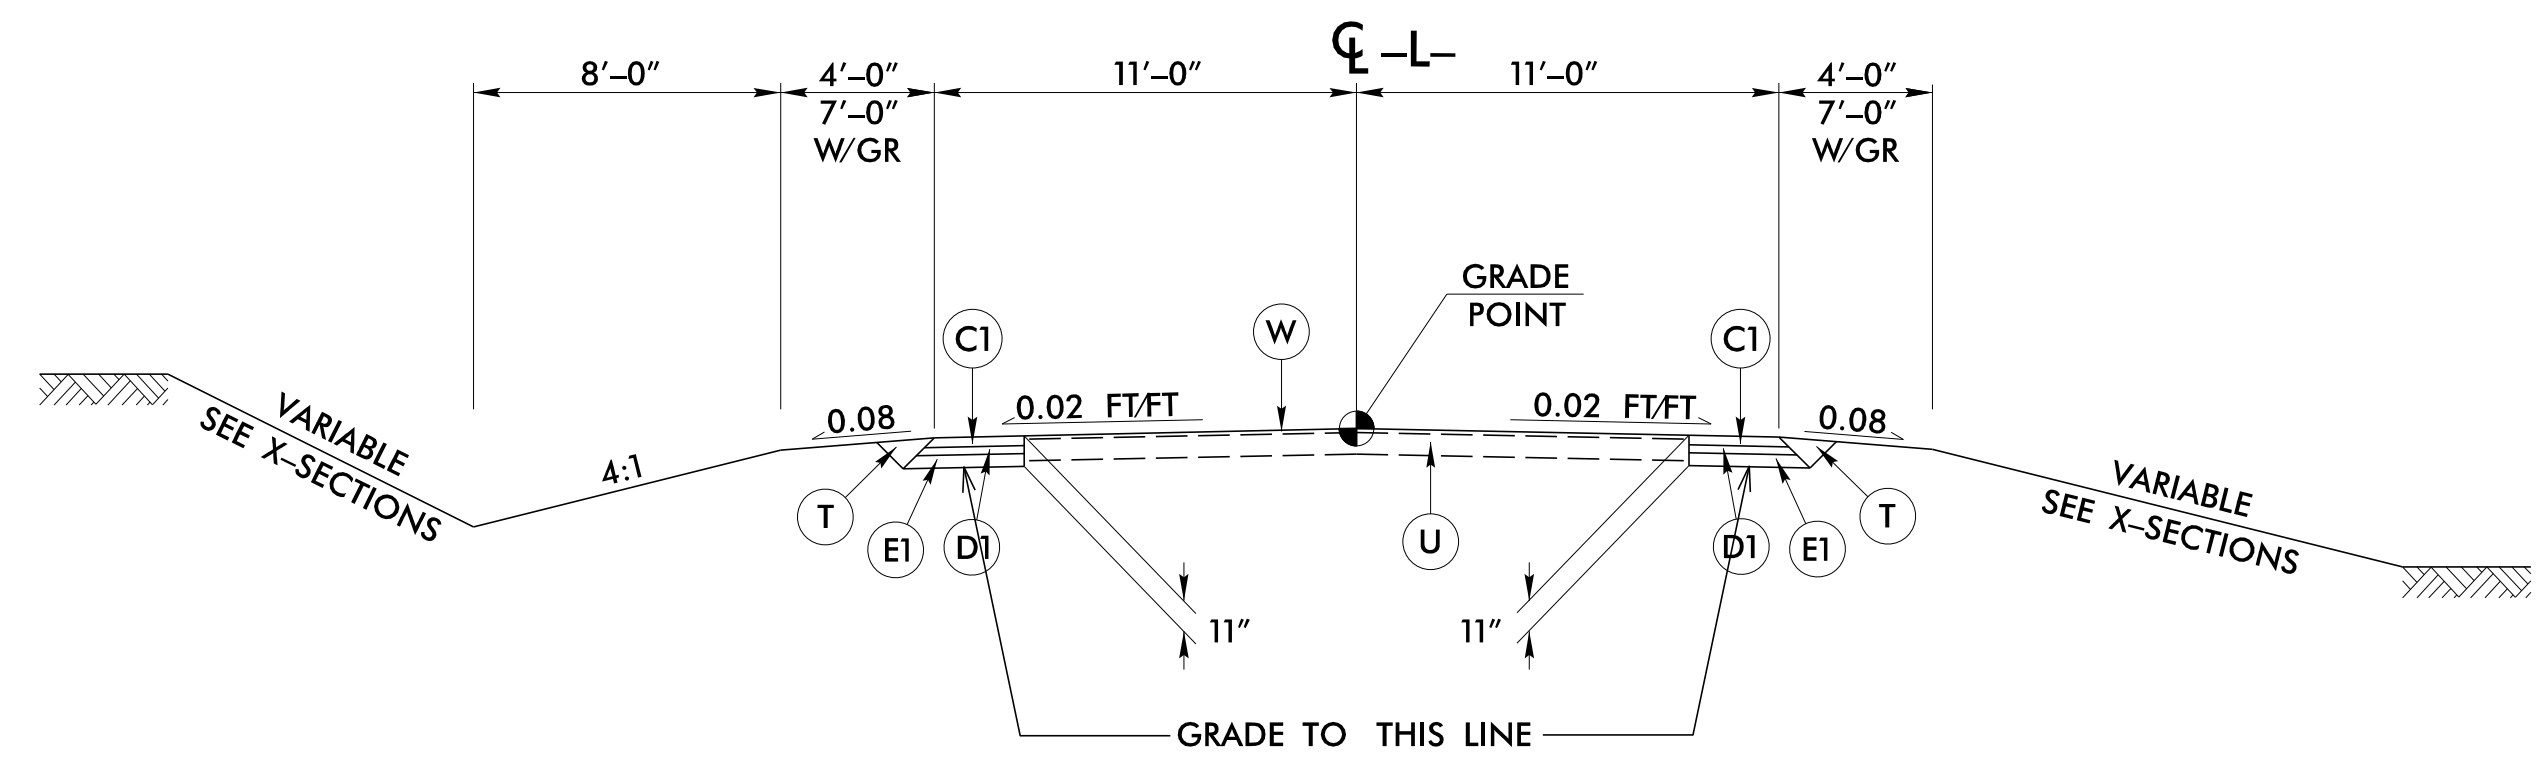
DETAIL SHOWING SHOULDER BERM GUTTER LOCATIONS
